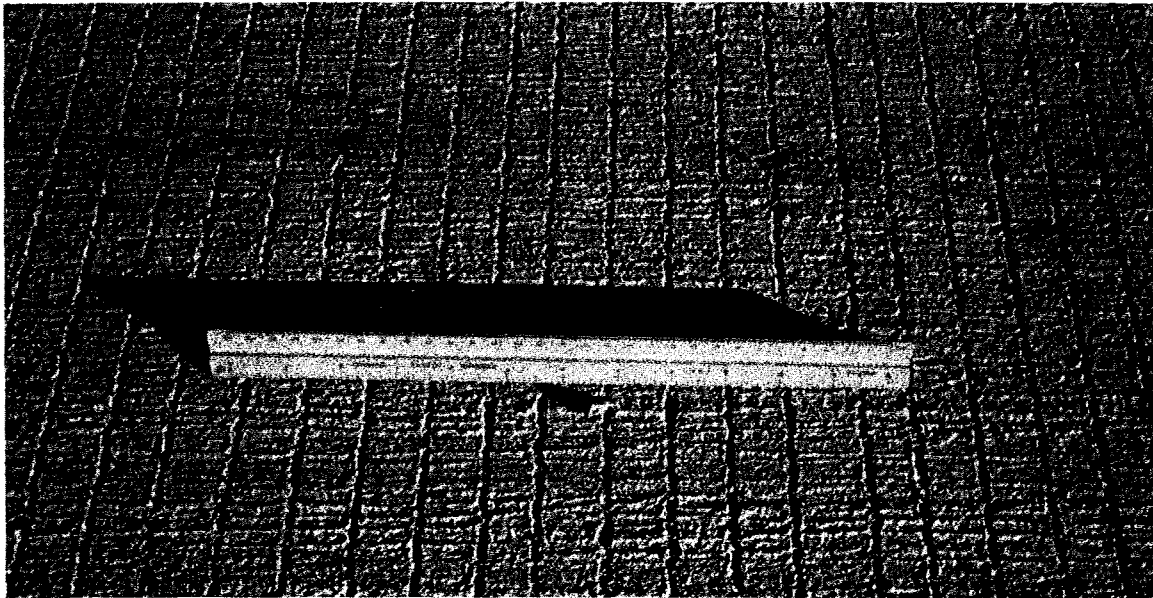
Test Section F-21: Burlap + 1 in. Transverse
